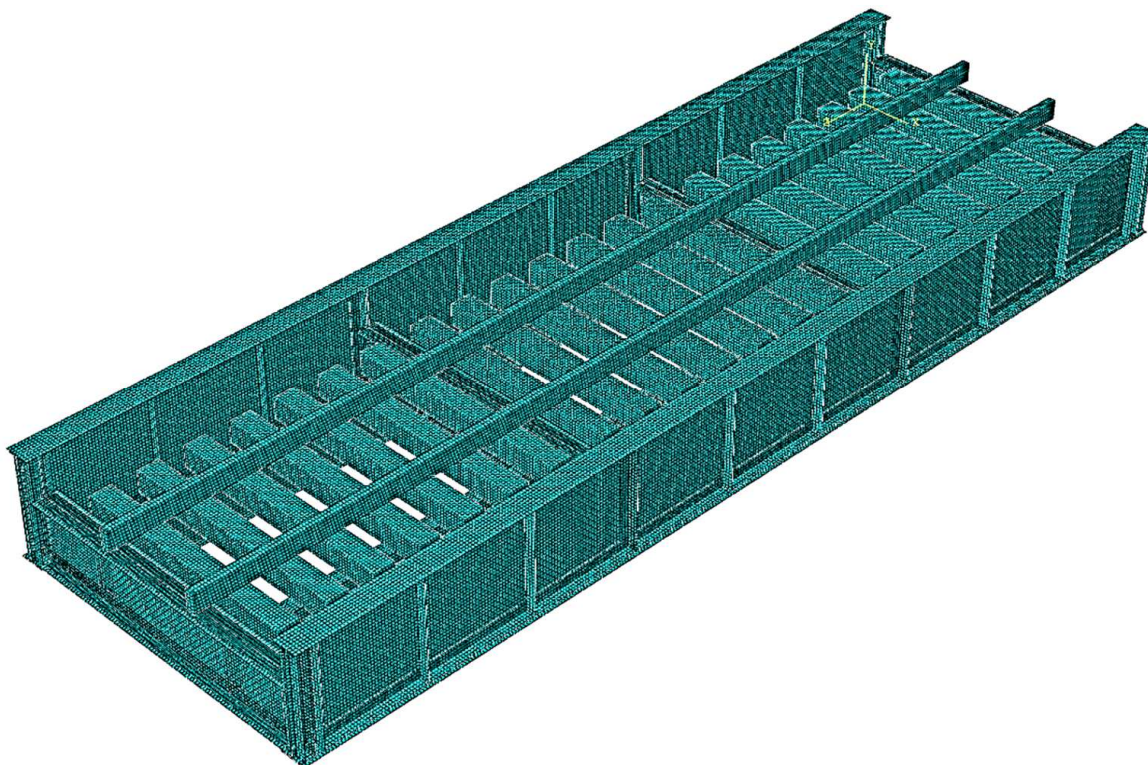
The floor beam of through-plate girder bridge with rail ties and rails.
